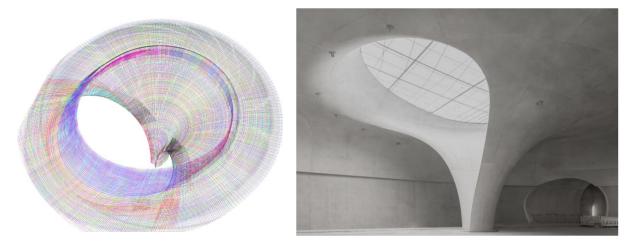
Railway Station "Stuttgart 21". Left: 3D parametric model of the concrete reinforcement (© Werner Sobek AG) Right: View of one the built 28 concrete "chalices" (© Ingo Rasp)
